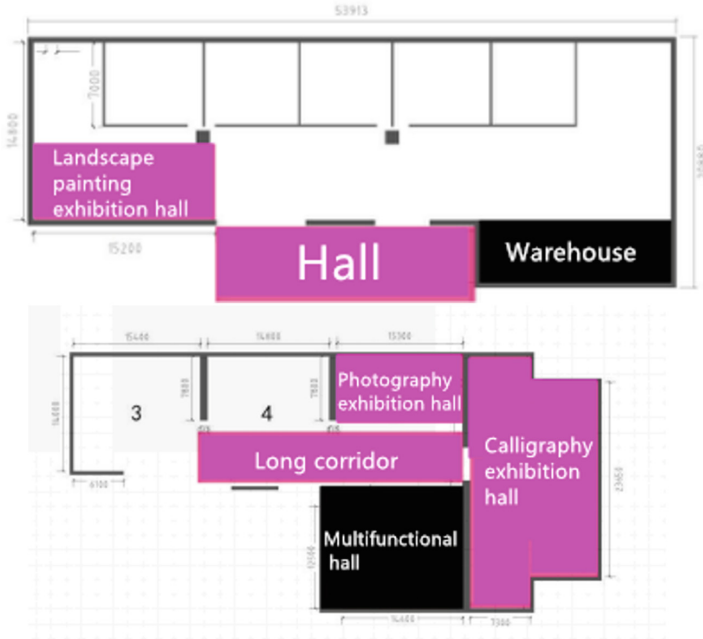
Floor 1 and floor 2 plan of Dalian Zhongshan art museum
